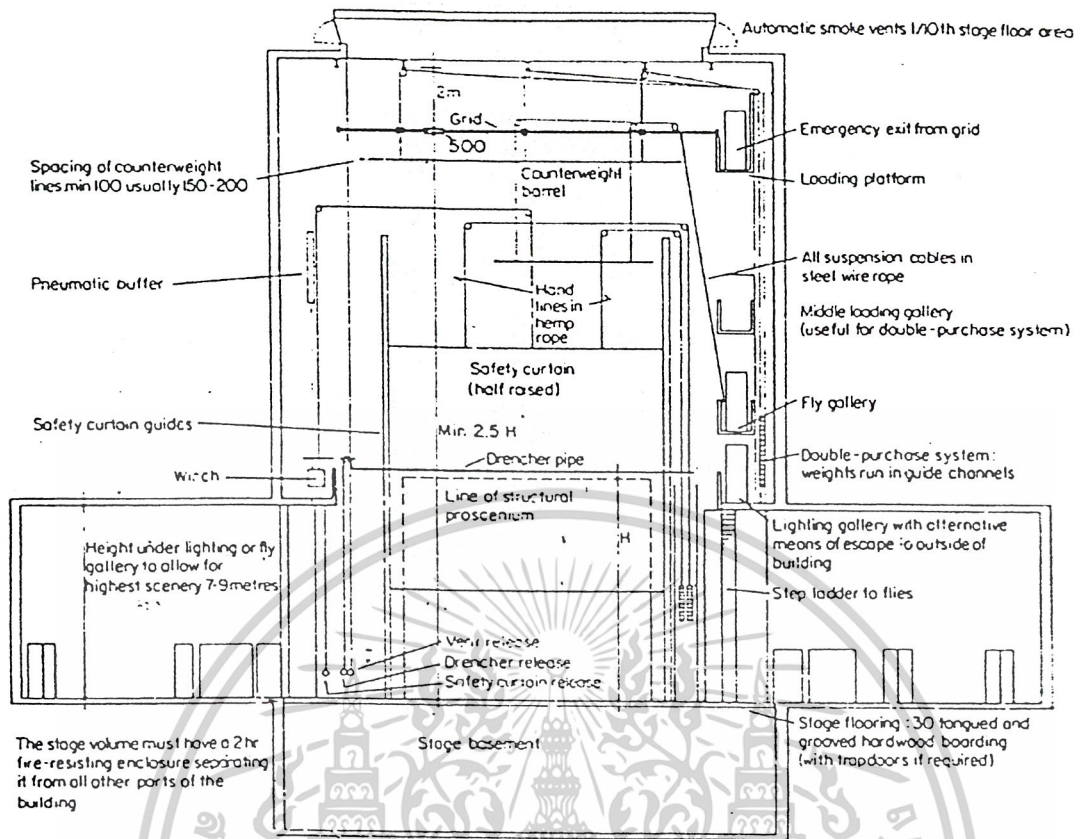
Typical section through stage and fly tower looking towards auditorium
